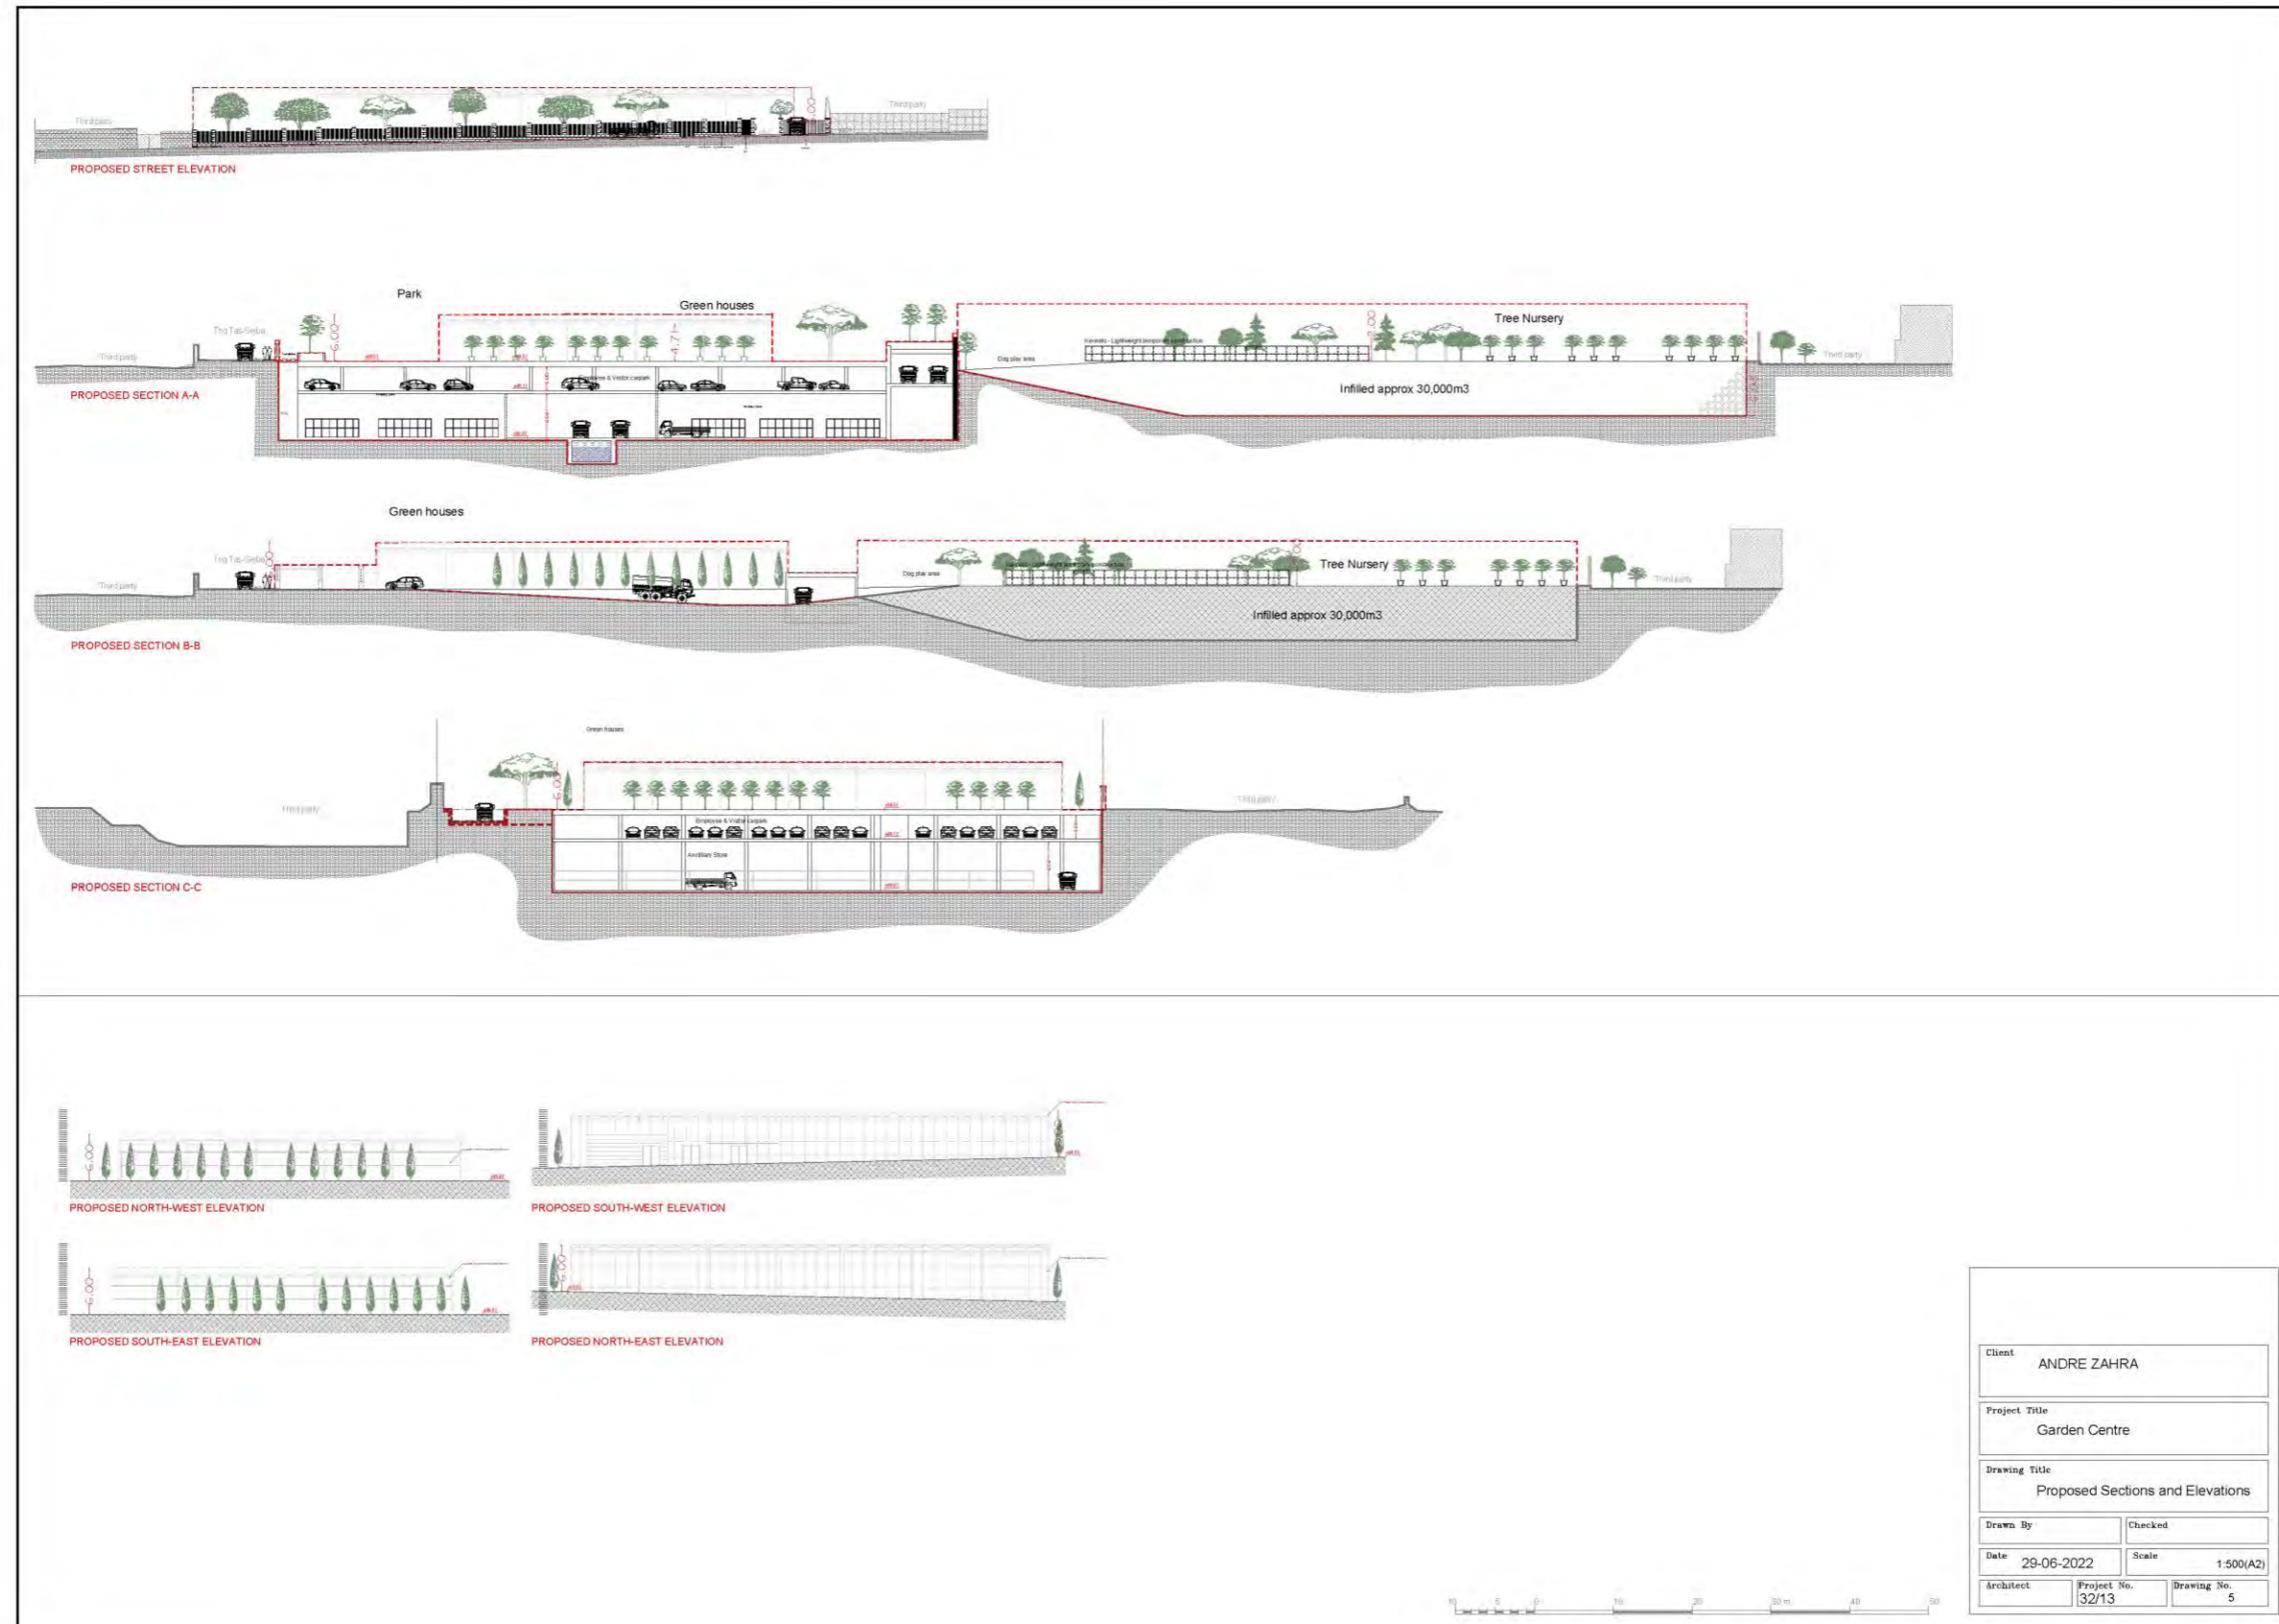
PROPOSED ELEVATION AND SECTIONS OF GROUND FLOOR DEVELOPMENT
